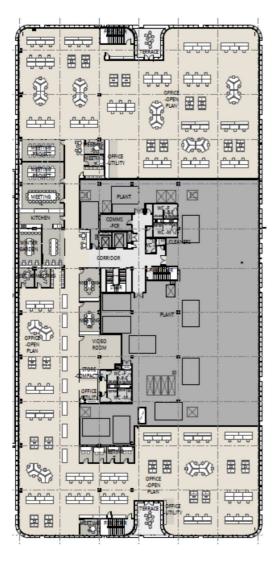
Site & Ground Floor Plan of the QGFTC building
